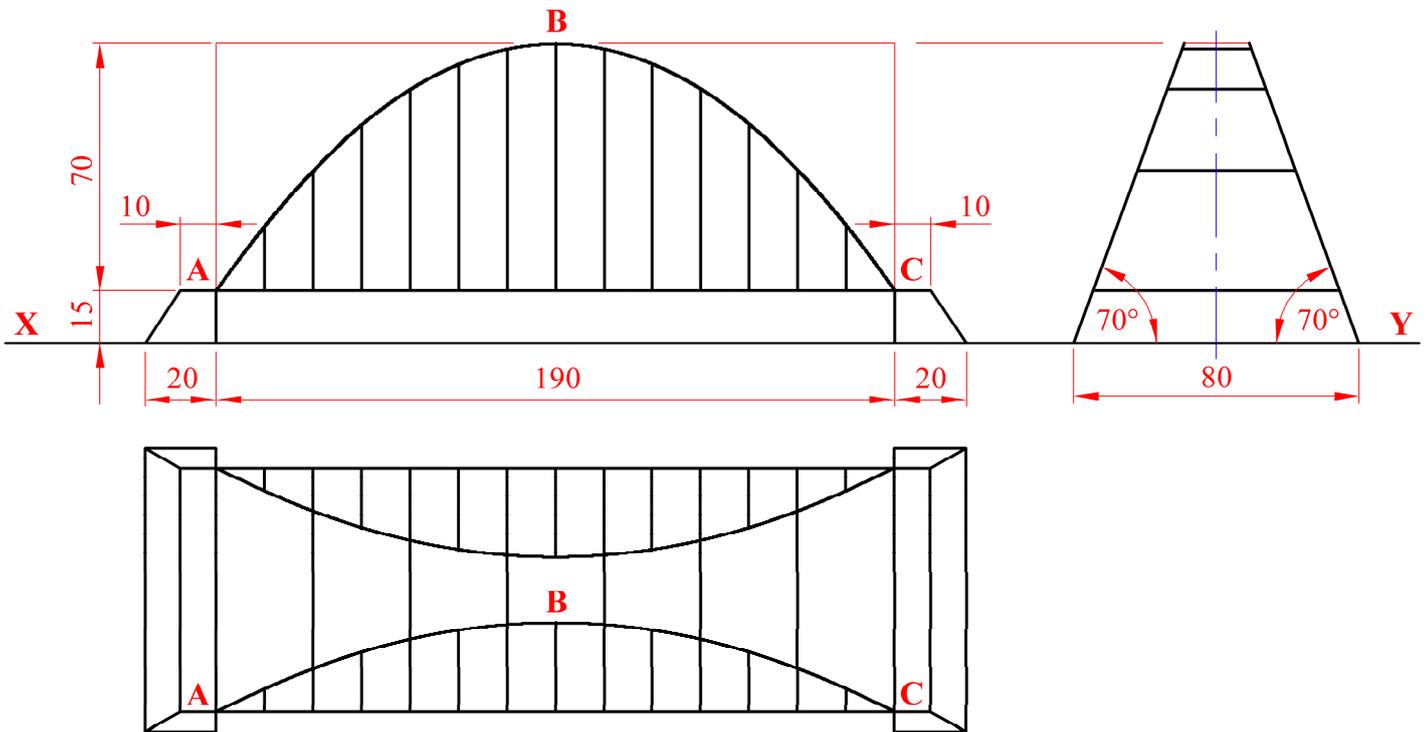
shows the elevation, plan and end view of a model of the bridge. The curve ABC is a parabola in elevation with vertex at B.
